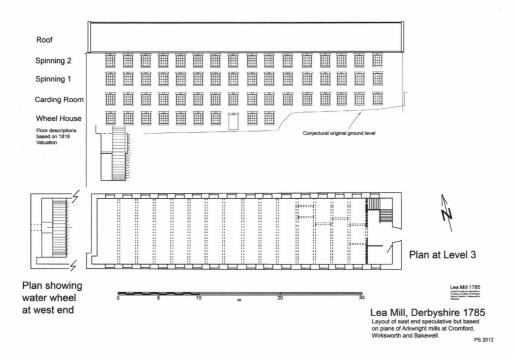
Cross-section and floor plan of Nightingale's Cotton Mill at Lea Bridge, as it would have been c1785. [Courtesy of Dr Patrick Strange]
